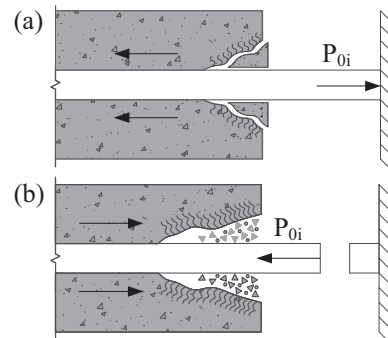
Initial anchorage zone damage: a – due to concrete shrinkage and temperature change before reinforcement release; b – due to reinforcement release.
